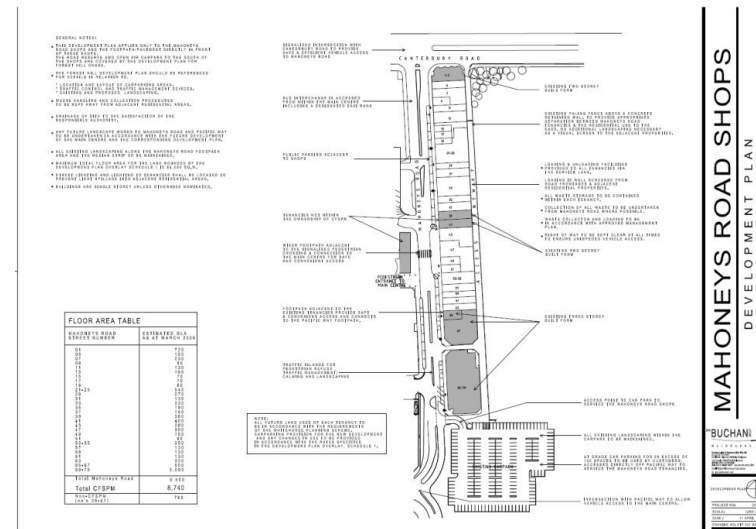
Endorsed Development Plan, Shopping Centre & Carpark
